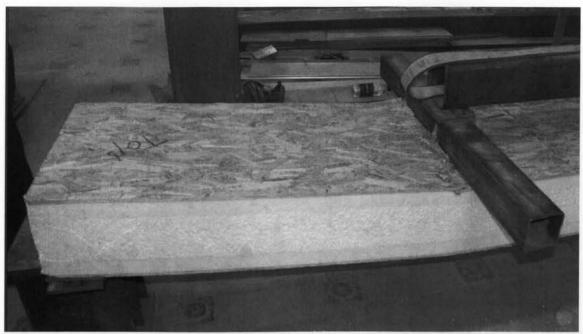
View of panel S-4 after failure showing OSB top facing crushing at the quarter point load location
